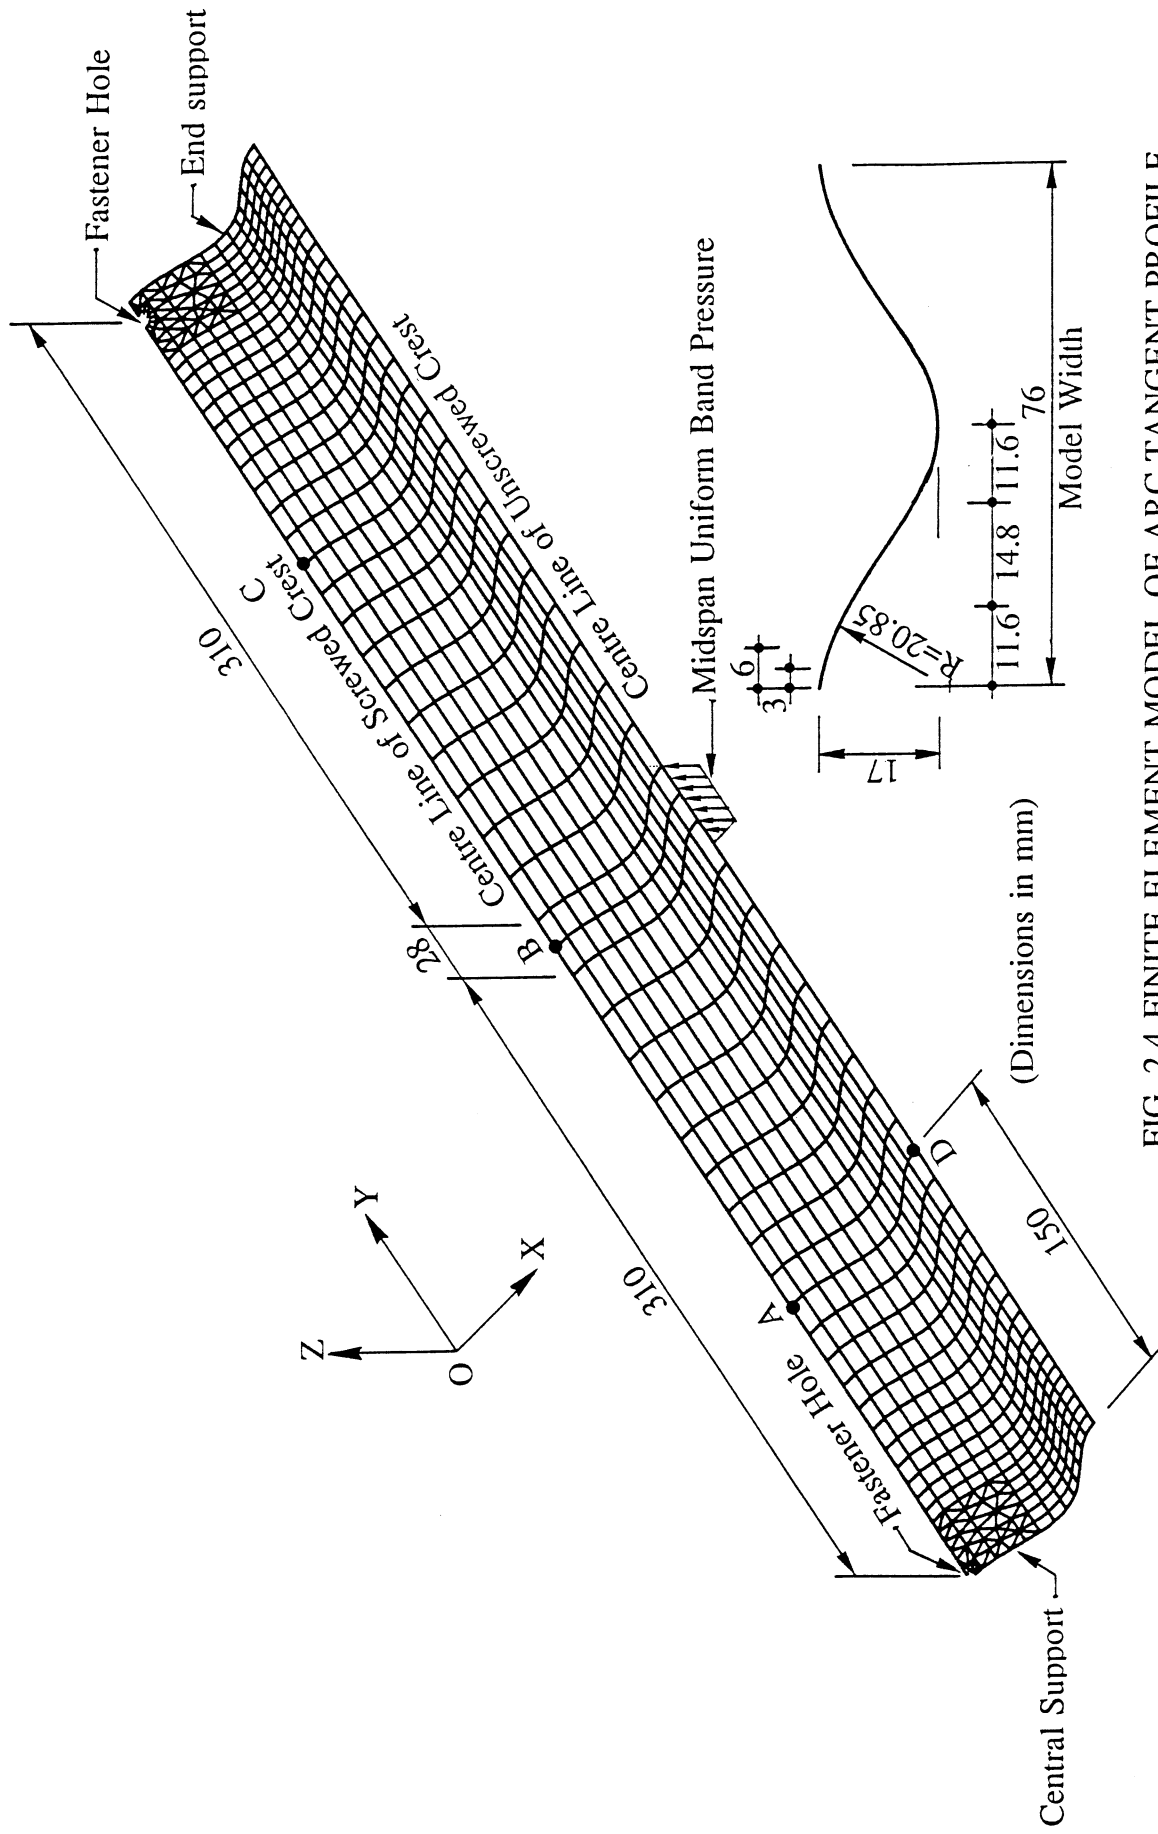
FINITE ELEMENT MODEL OF ARC-TANGENT PROFILE ROOFING SHEET
